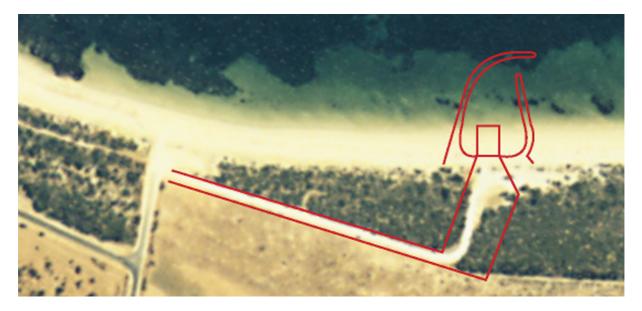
Location of Existing Ramp and Previously Proposed Ramp, Breakwaters and Car Park
